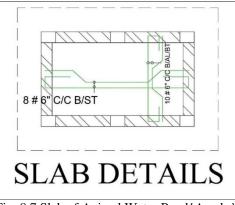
Slab of Animal Water Pond{Avedo}
